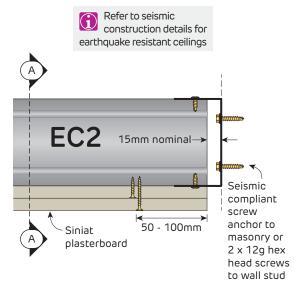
Sliding Connection EC2 Slotted Deflection Head Track Section
